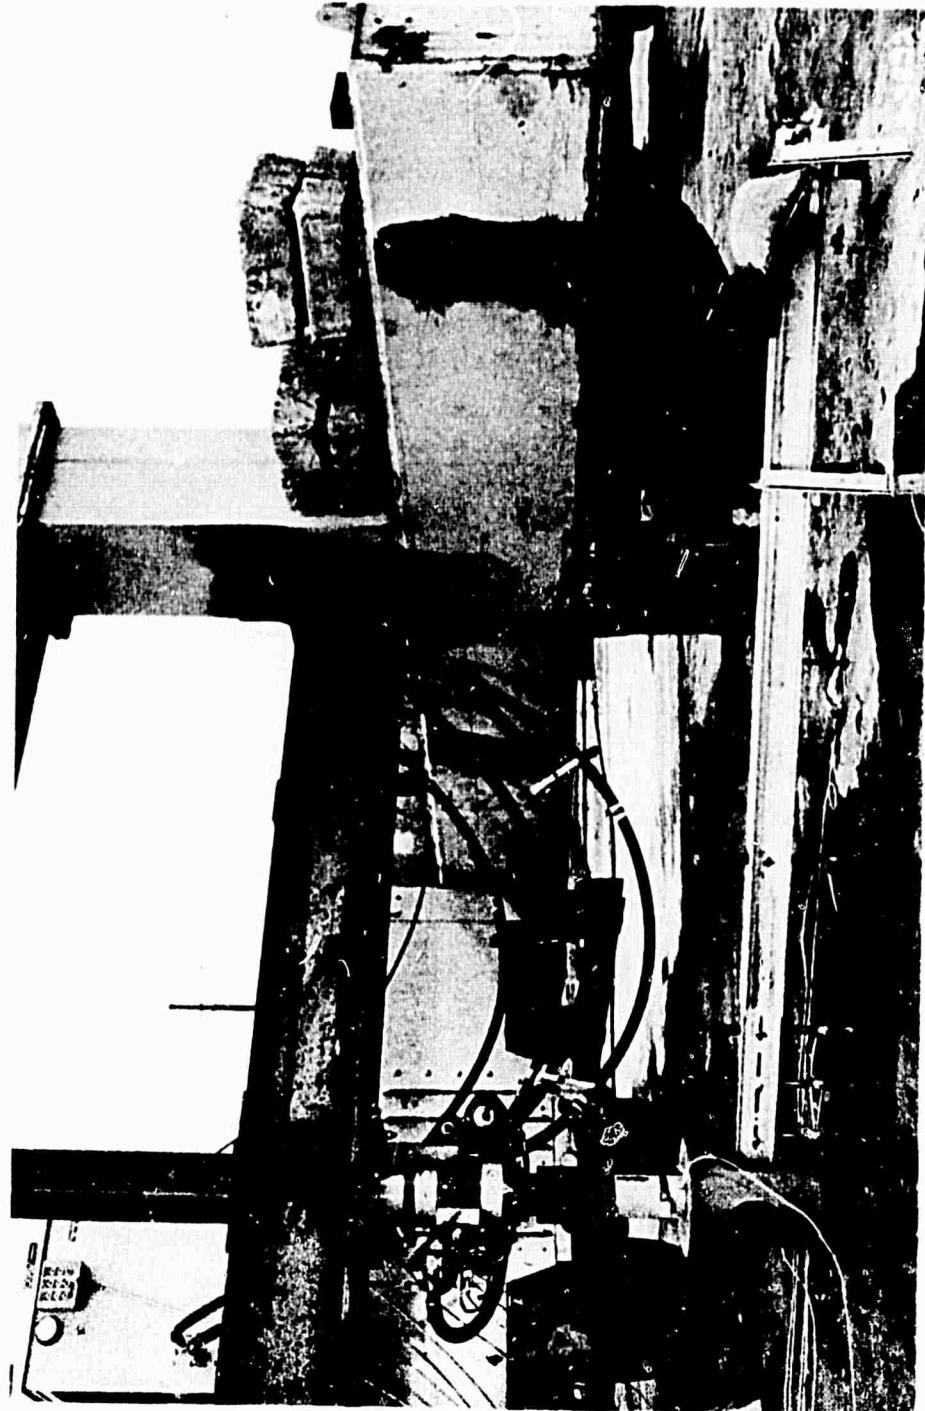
Loading equipment and instrumentation for pavement deflection tests
